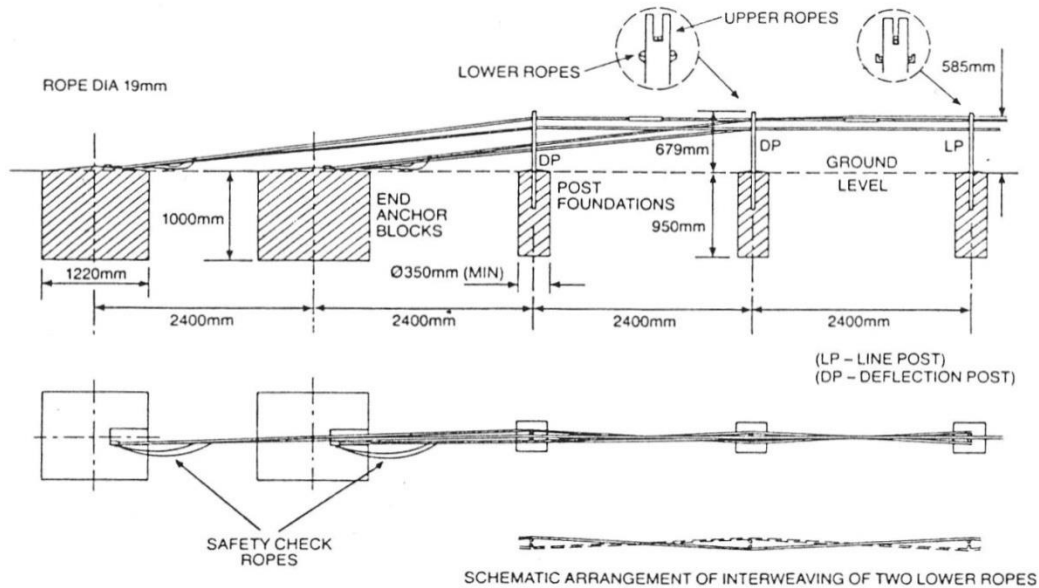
Four-Rope System Details, Bridon Ropes, 1988-1989 [36]
